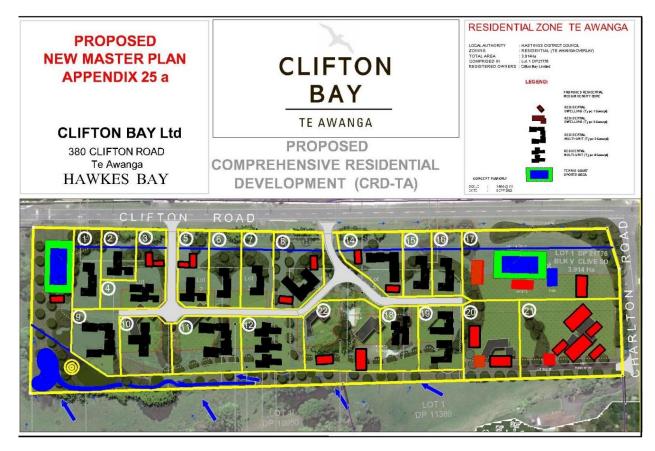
Proposed New Master Plan - Overlaying Existing Master Plan
